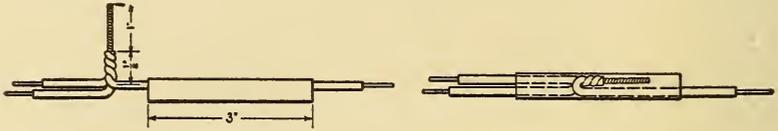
DETAILS OF WIRE JOINT IN Y SPLICE.
